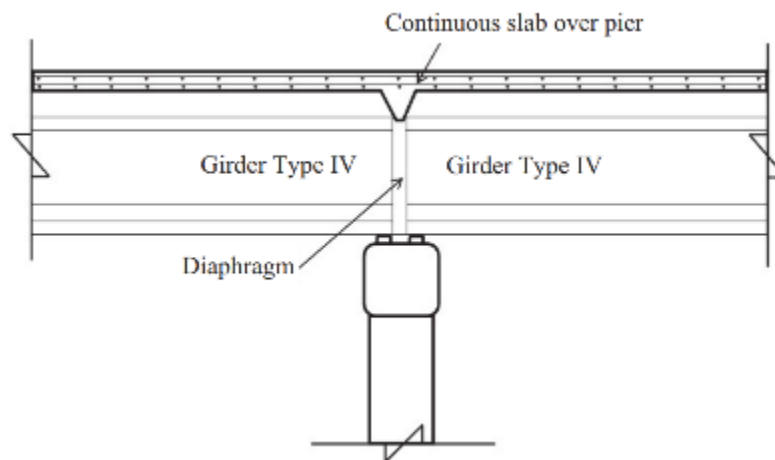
Typical continuity joint between girders (Eamon et al. 2016)
